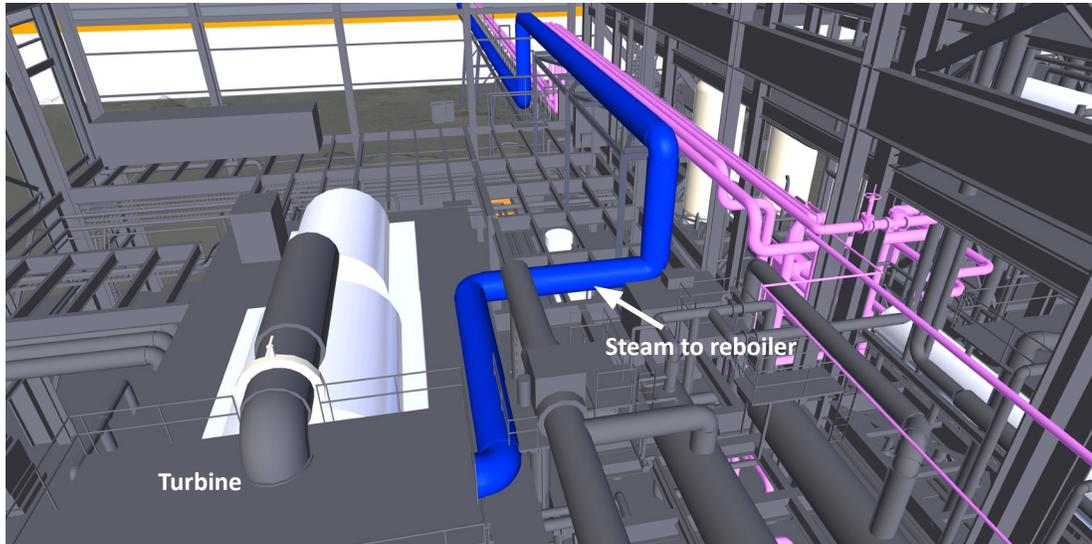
Proposed design and location of the process steam extraction line to the reboiler (highlighted in blue with the north wall of the powerhouse hidden)
